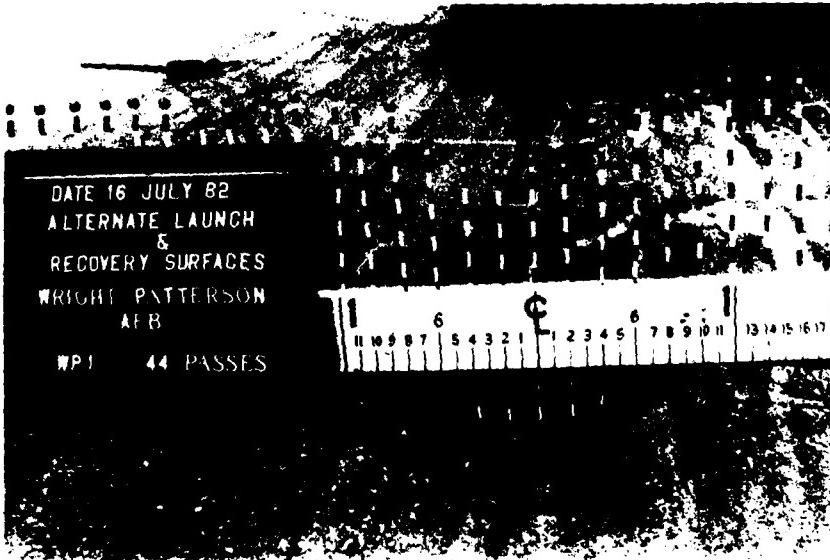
Closeup of Measurement Showing Maximum Deformation at Failure
